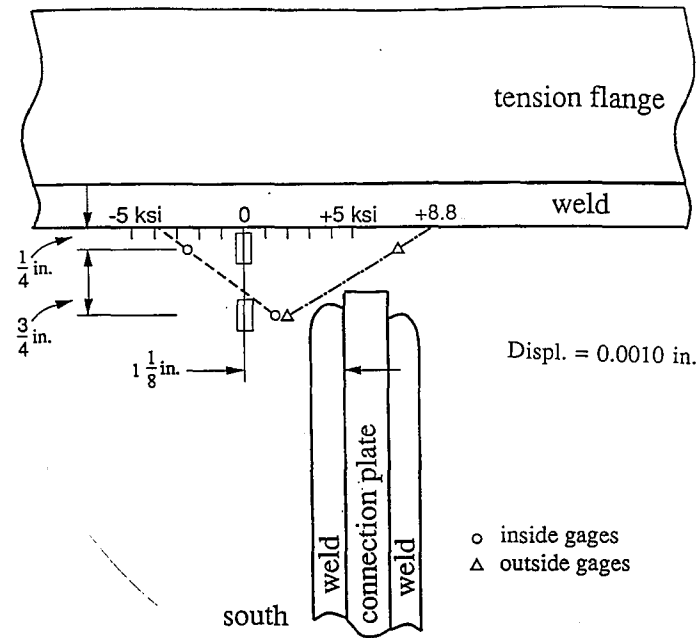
Static Stress Distribution for Outside Girder at Pier S5-2 Floorbeam Two with Dump Truck in Outside Lane (Worst Case)
